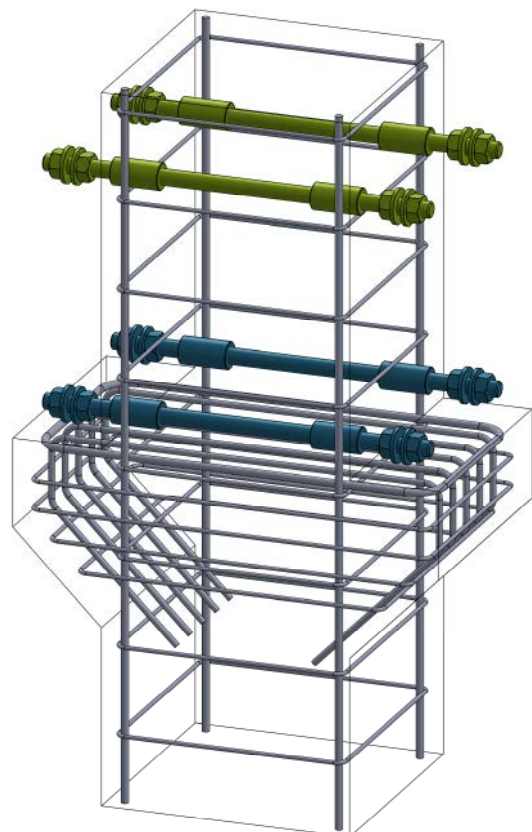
COPRA® Anchoring Couplers in a double-sided beam-to-column connection.
